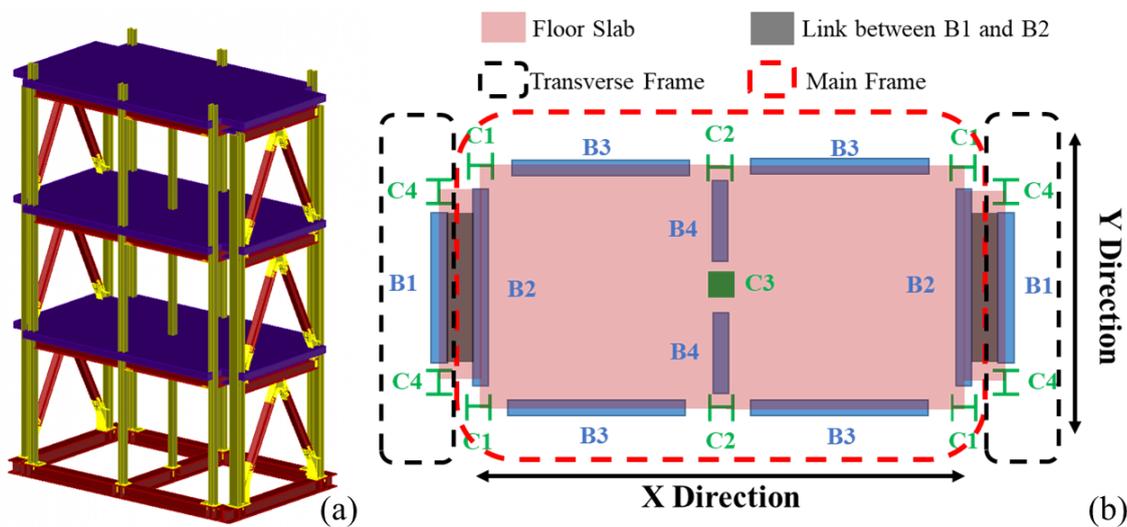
(a) General View of the Proposed Steel Structure and (b) Designed Plan Layout
